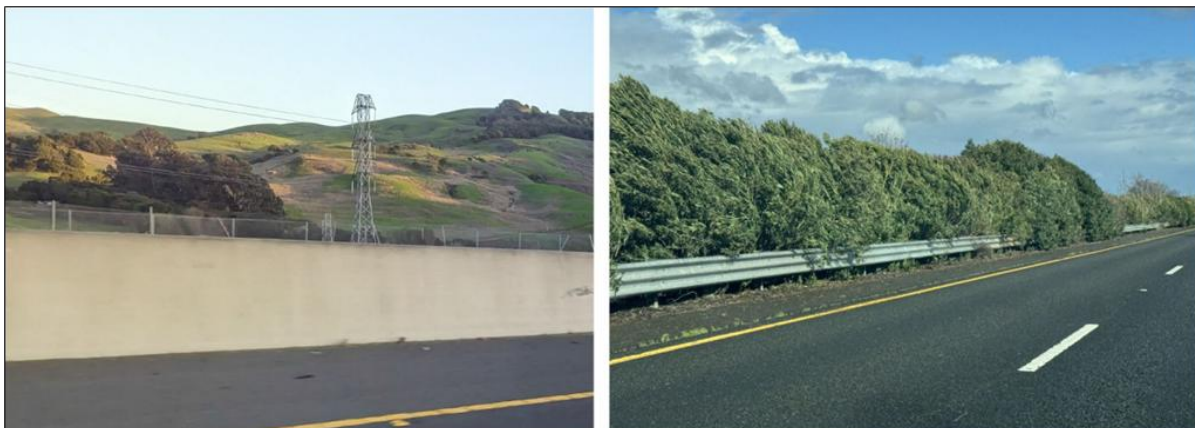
& Figure D.2 Samples of typical concrete barriers and three-beam guardrail installed on highways I-80 near Sacramento, California, USA (Nemati et al., 2014; [CC BY 4.0](#)).
